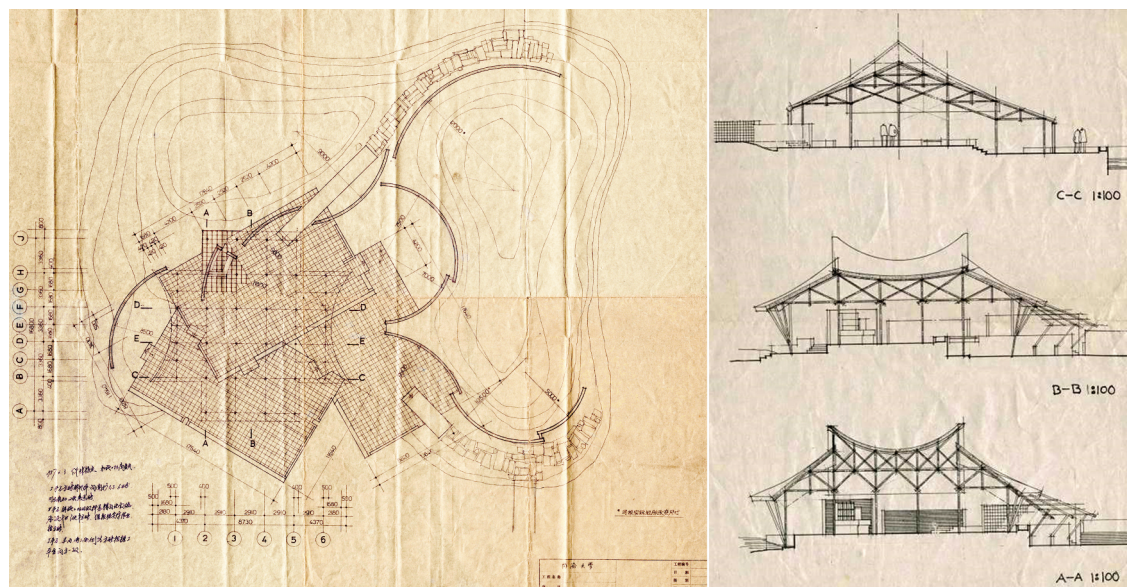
The plan and sections of Helou Pavilion. (Drawn by Feng Jizhong and provided by Feng Ye).
